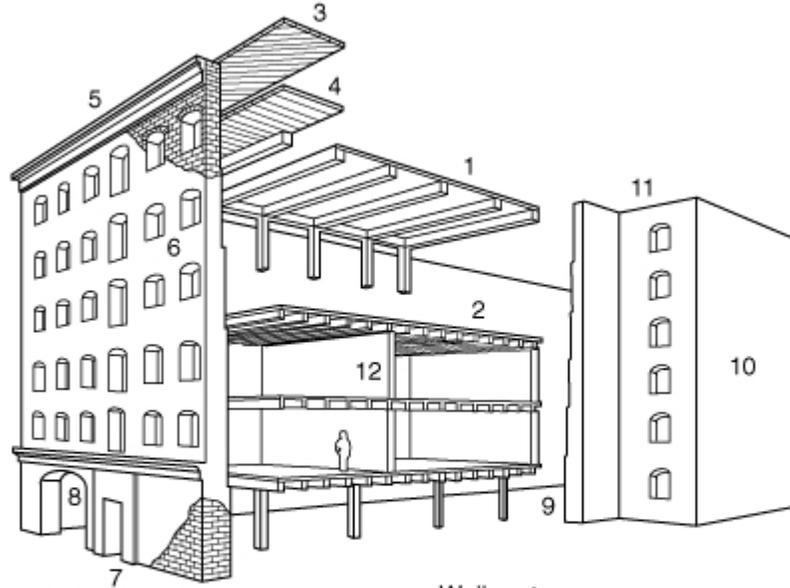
(m) Unreinforced Masonry Bearing Wall, Example 2 of 3.
